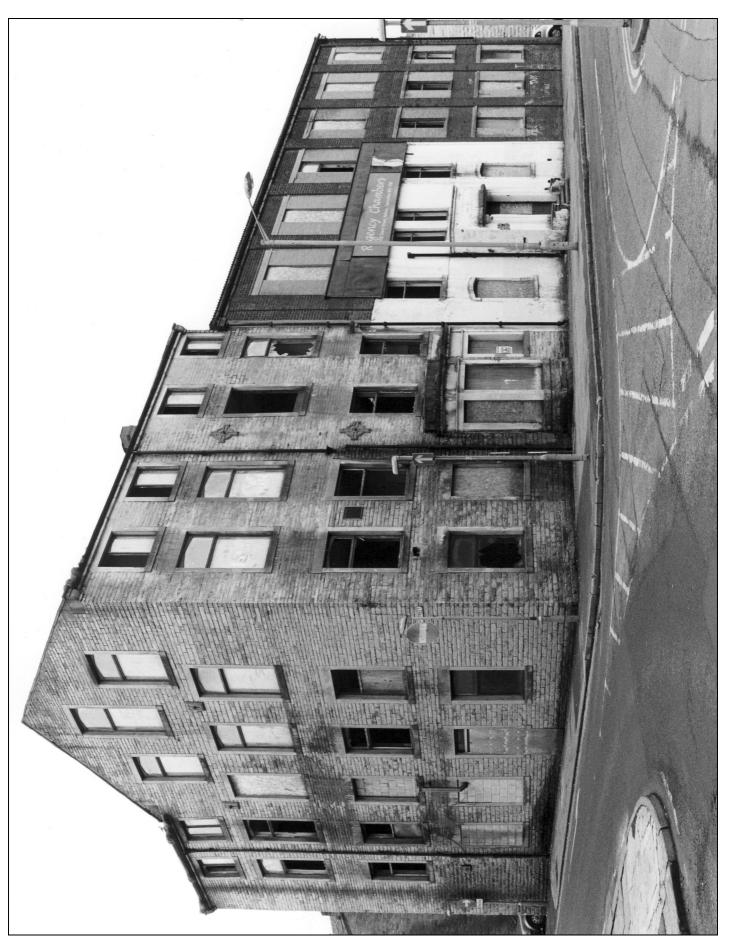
View of the building from the north-east (Stanley Street and Every Street elevations)
